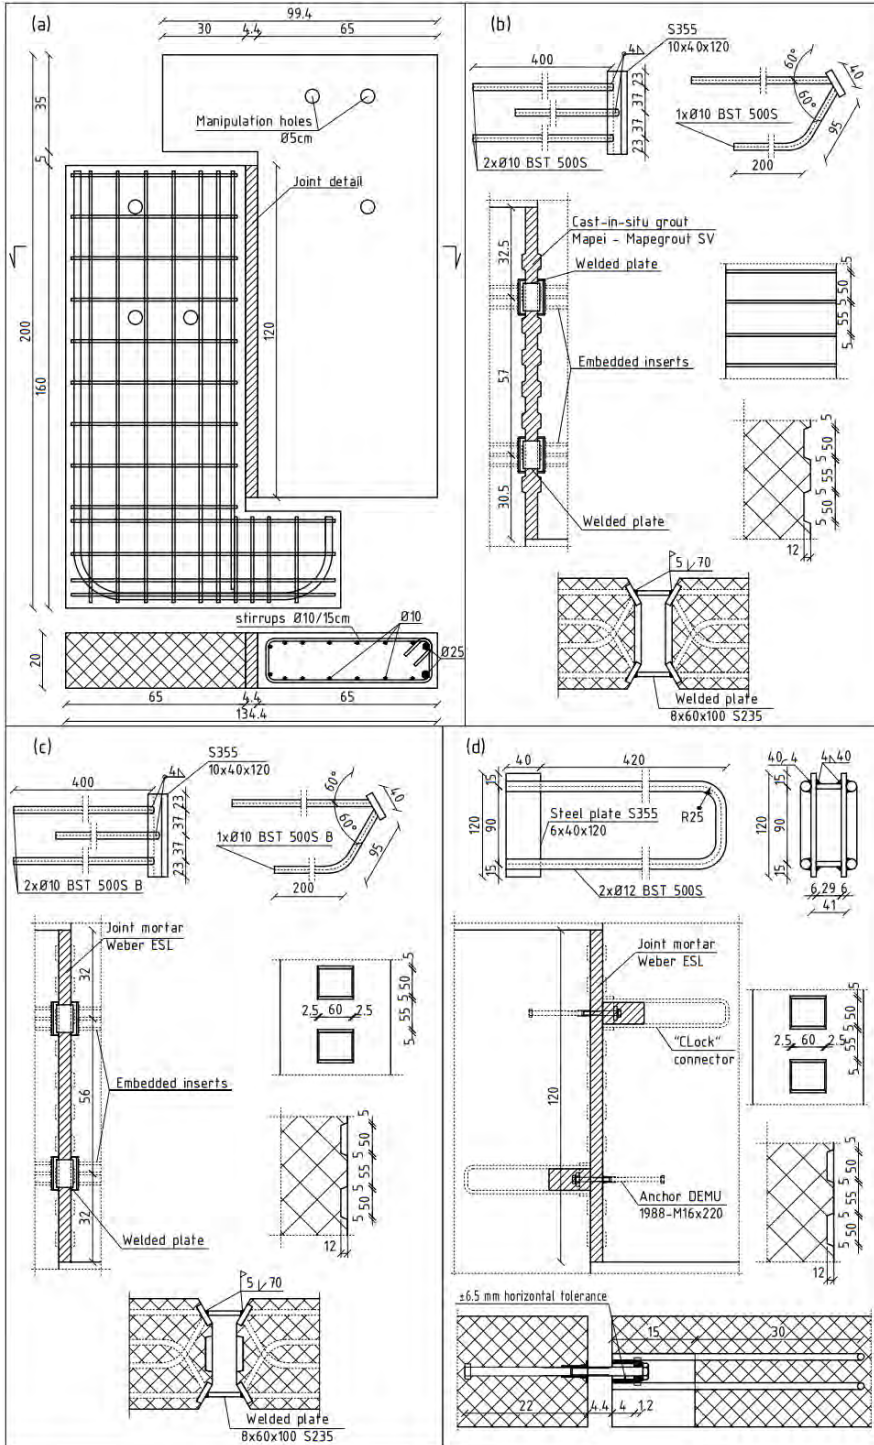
Test specimens' details [in cm]: a) Wall panels geometry and reinforcement; b) specimens SA1; c) specimens SA2; d) specimens SA3;
